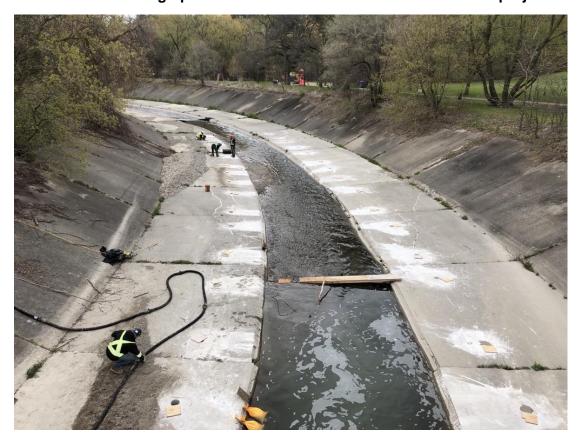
Yonge/York Mills Channel concrete repair in 2020.
